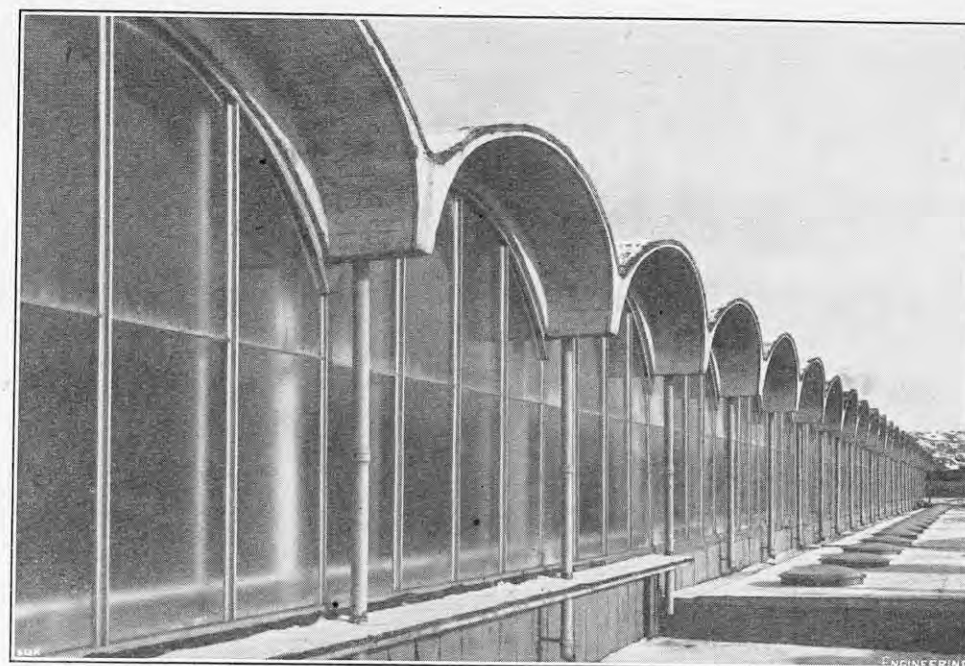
CLERESTORY SECTION OF DRUG ROOM.
